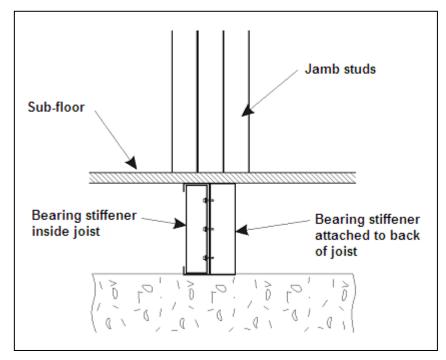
Bearing Stiffeners Under Jamb Studs
